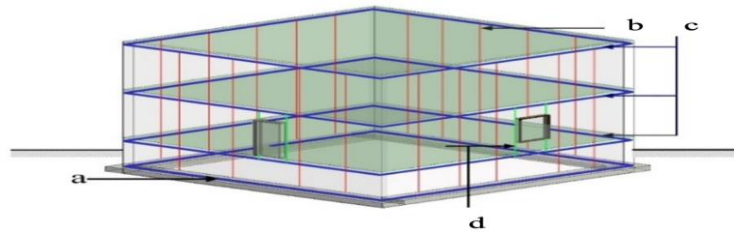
Structural reinforcement scheme of a house frame with rolled steel sections.
